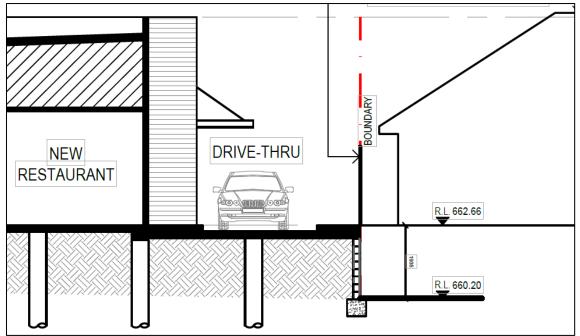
Cross-sectional Relationship between Proposed Food and Drink Premises and Adjoining Dwelling House Located to the North-West on Lot 1 DP 780821 (301 Howick Street)
